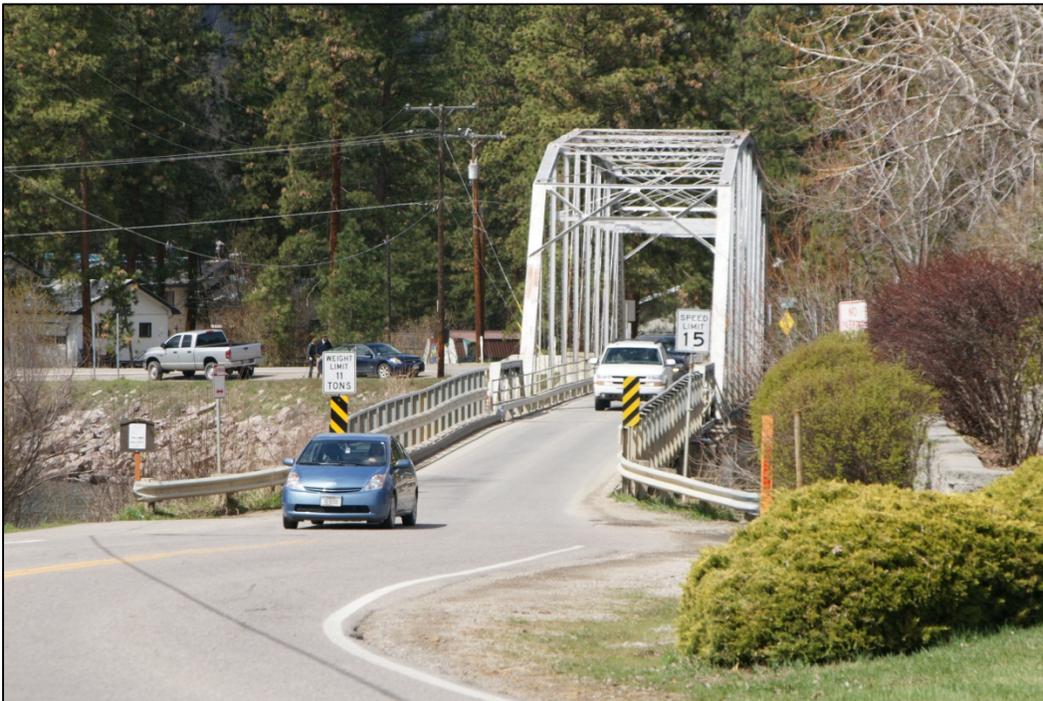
LOOKING WEST FROM NORTH AVENUE – NOTE 11 TON POSTED WEIGHT LIMIT
